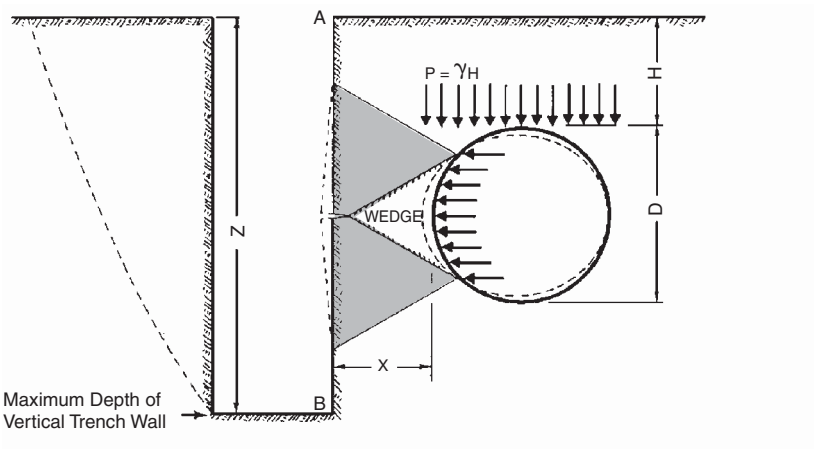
Vertical trench wall parallel to a buried flexible pipe showing the soil wedge and shear planes that form as the pipe collapses.
